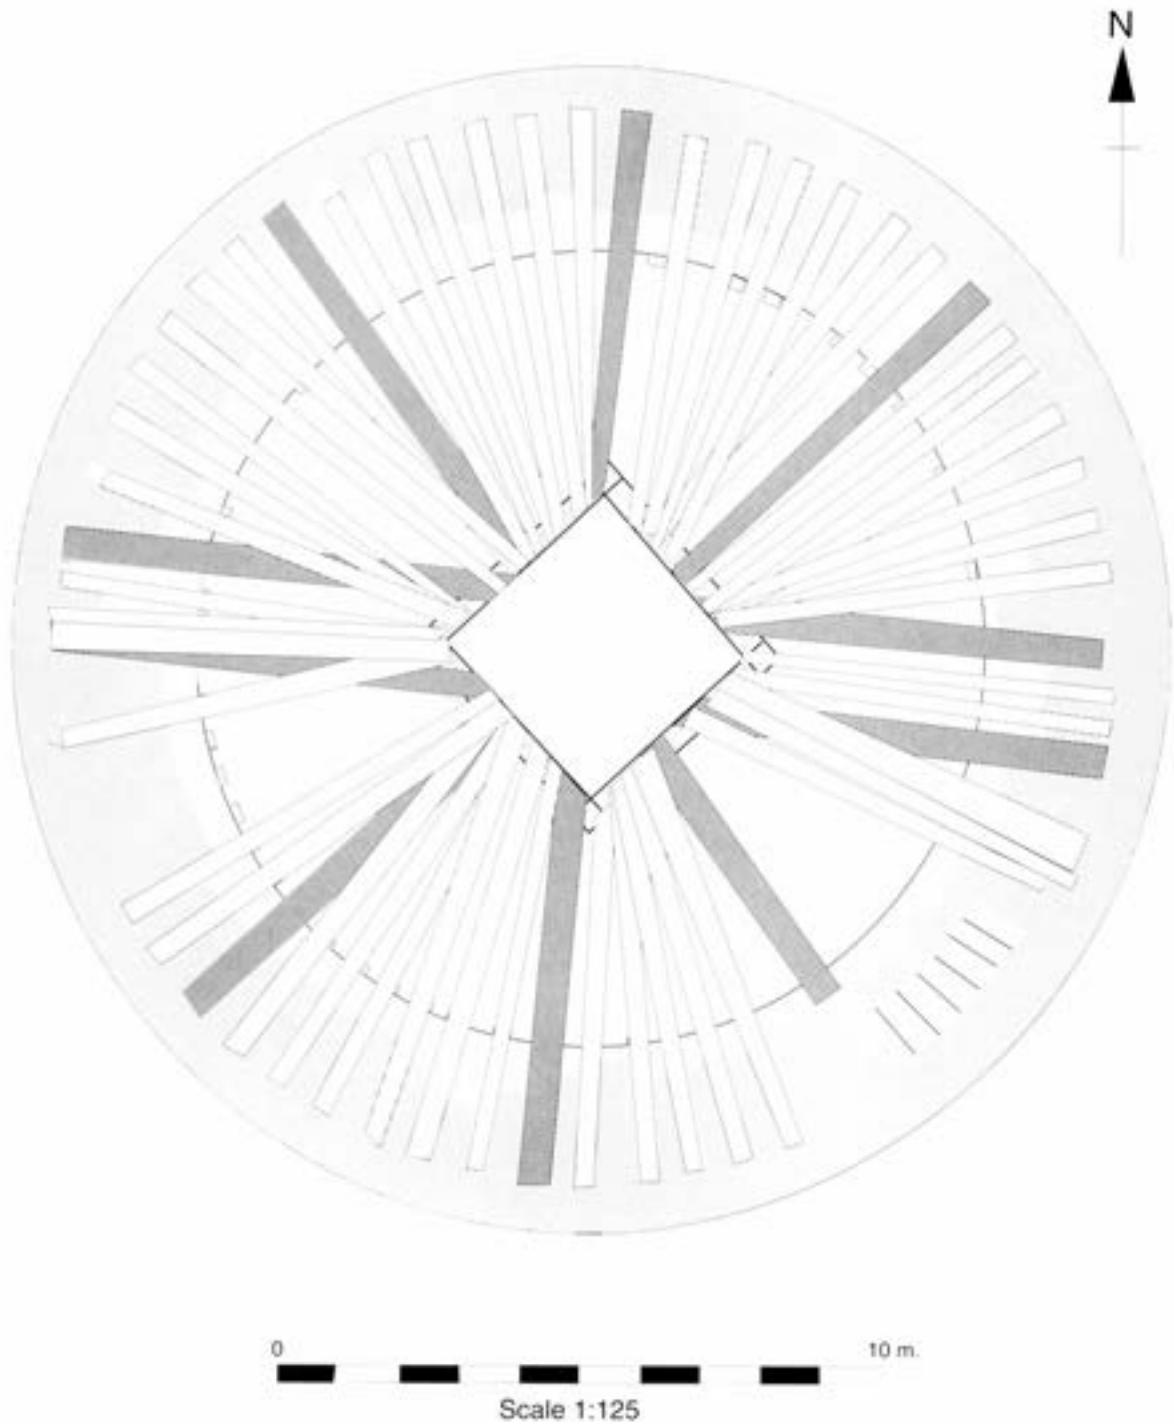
The Keep*: reconstruction of cannon deck timbers
